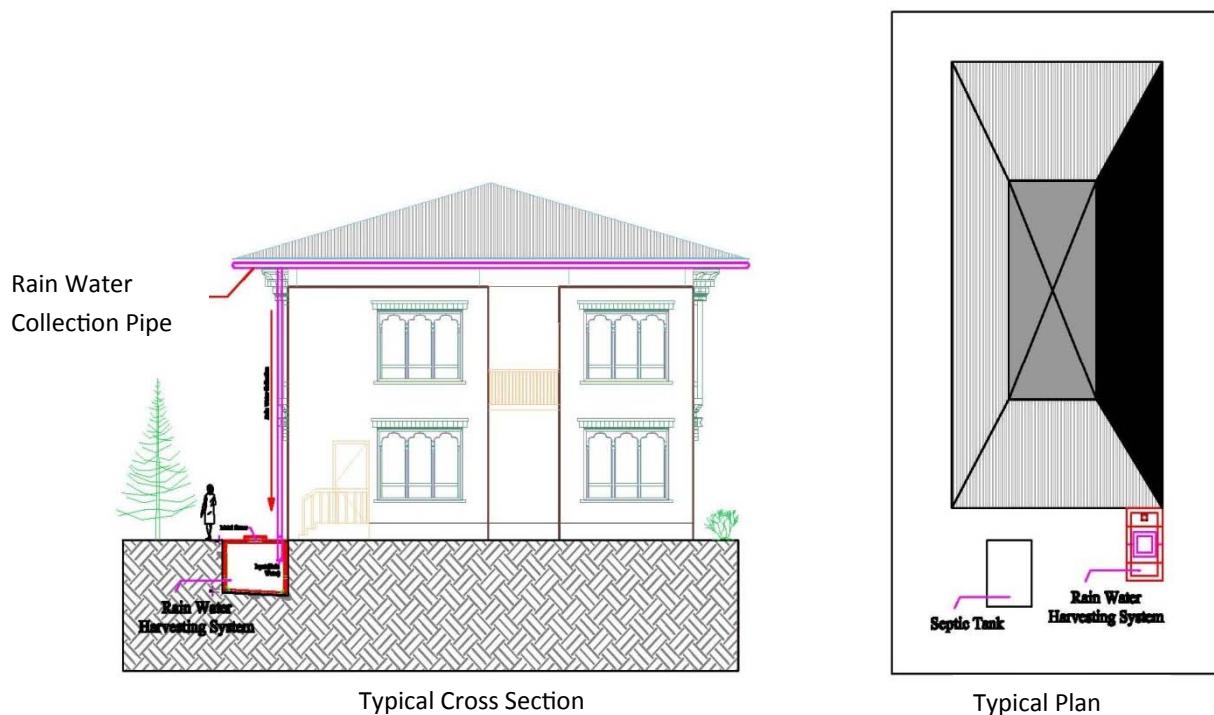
Typical Cross Section and Plan for Rain Water Harvesting System
